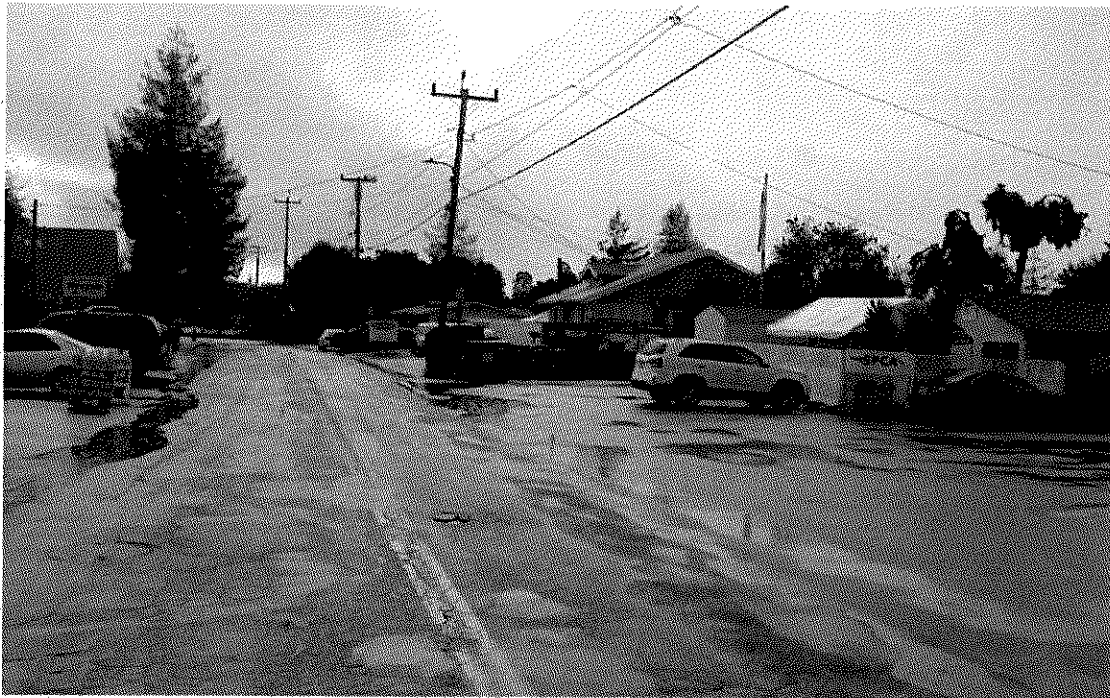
Photo from project frontage looking south showing road drainage heading south
